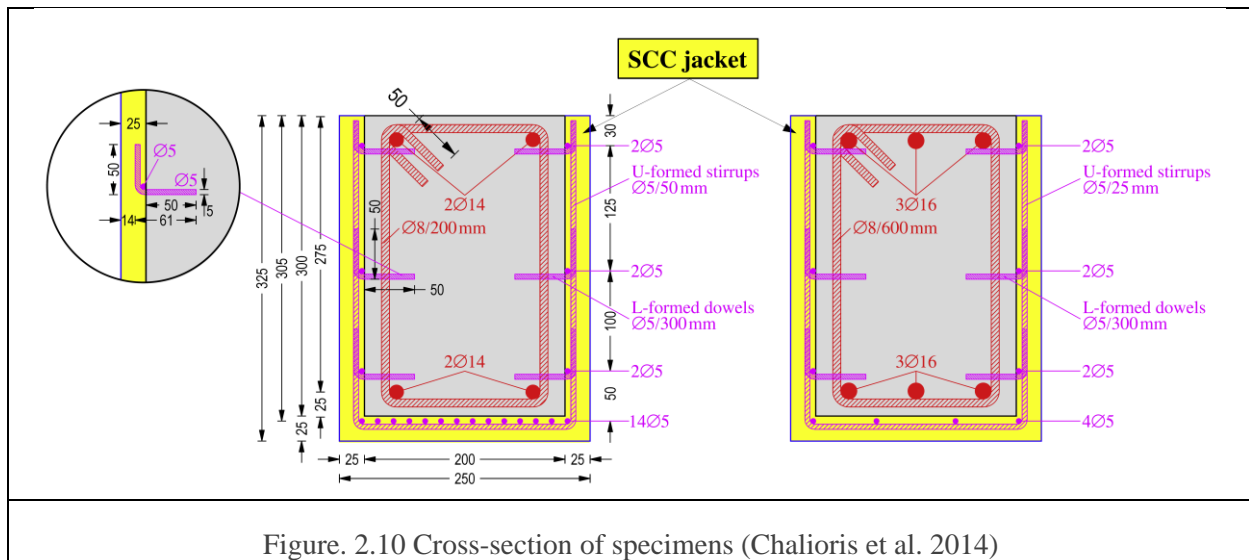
Cross-section of specimens (Chalioris et al. 2014)
